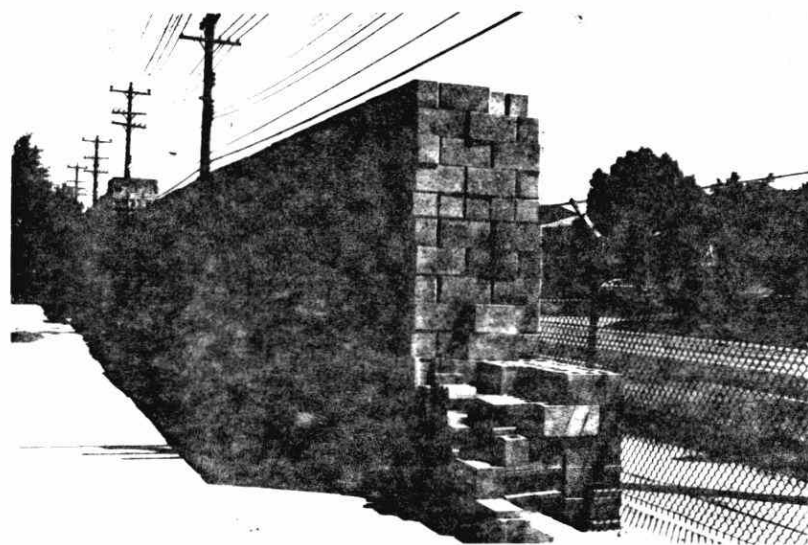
Concrete Block Storage & Seasoning. Wall forms a Sound Barrier.
